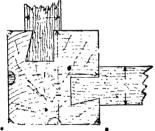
Section of Overdoor Pillar and Rail Ends.
